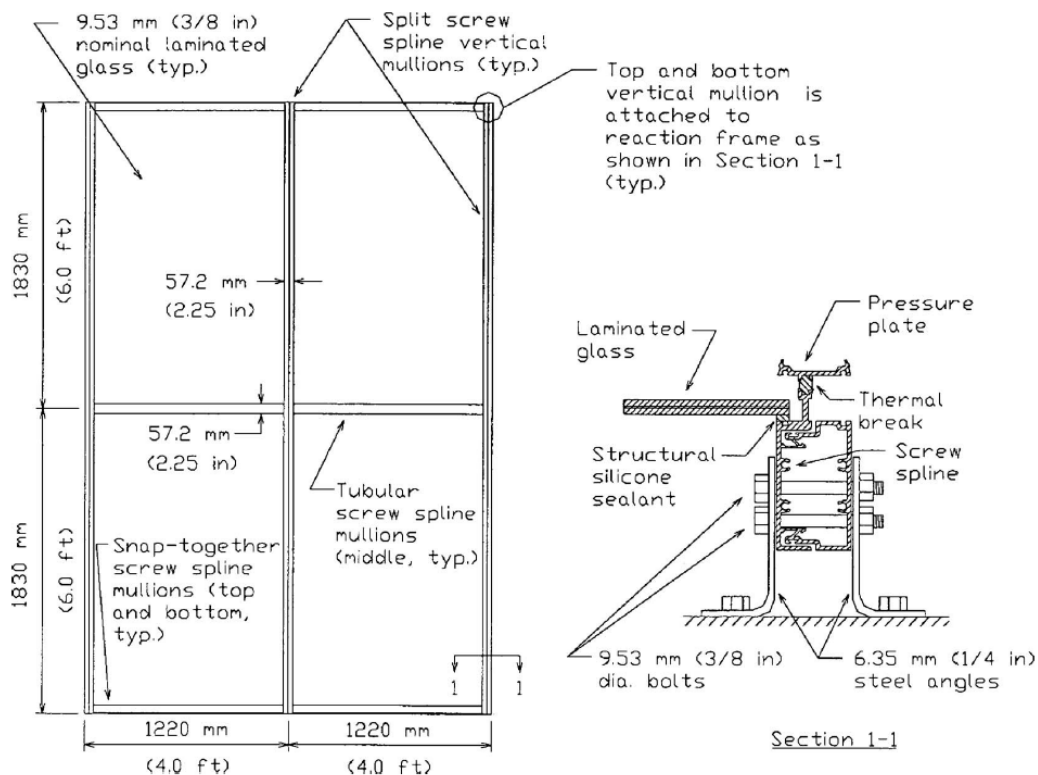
17 : Elevation and section of split screw spline curtain wall specimen
